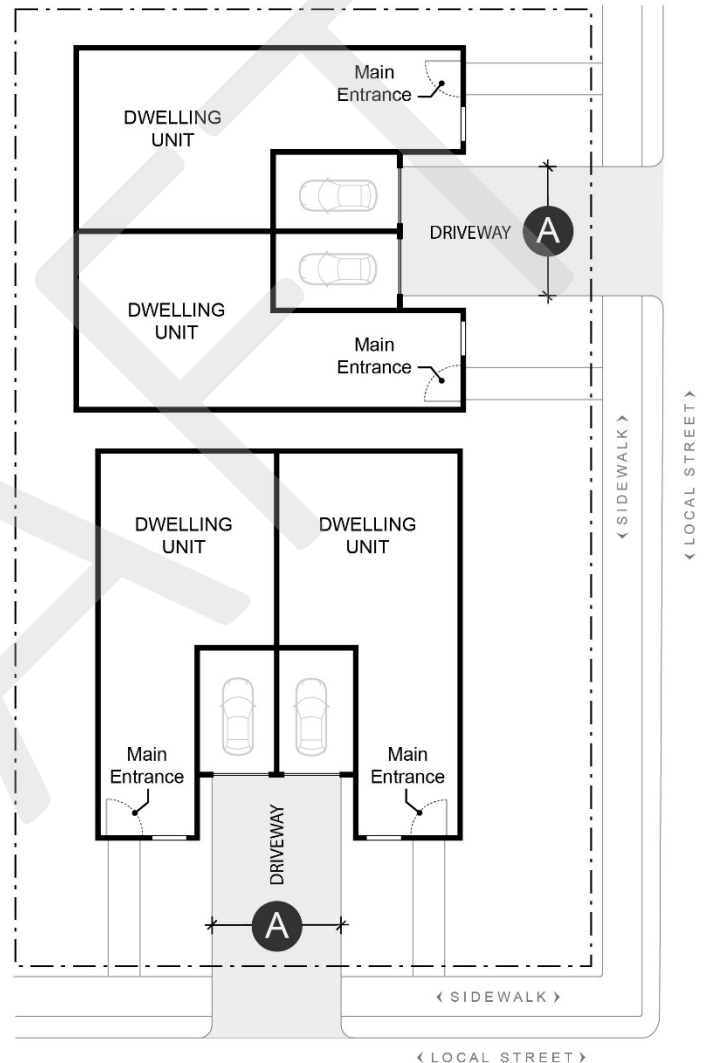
C.2.d. Driveway Approaches on One Local Street Frontage
